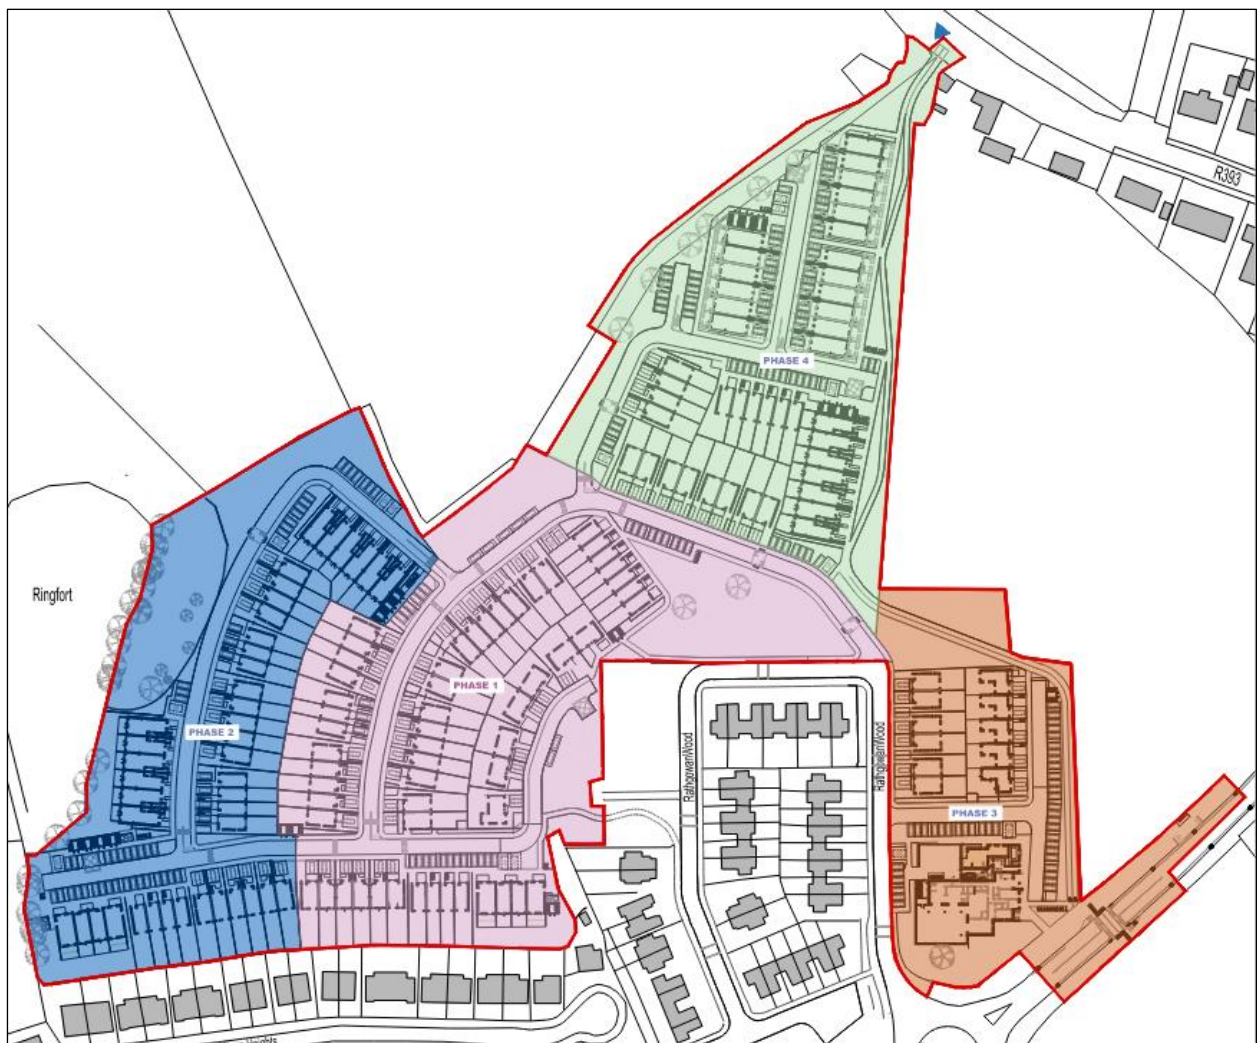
Proposed Site Layout Construction Phases (Extract: BKD Drawing 6253-P-003)
